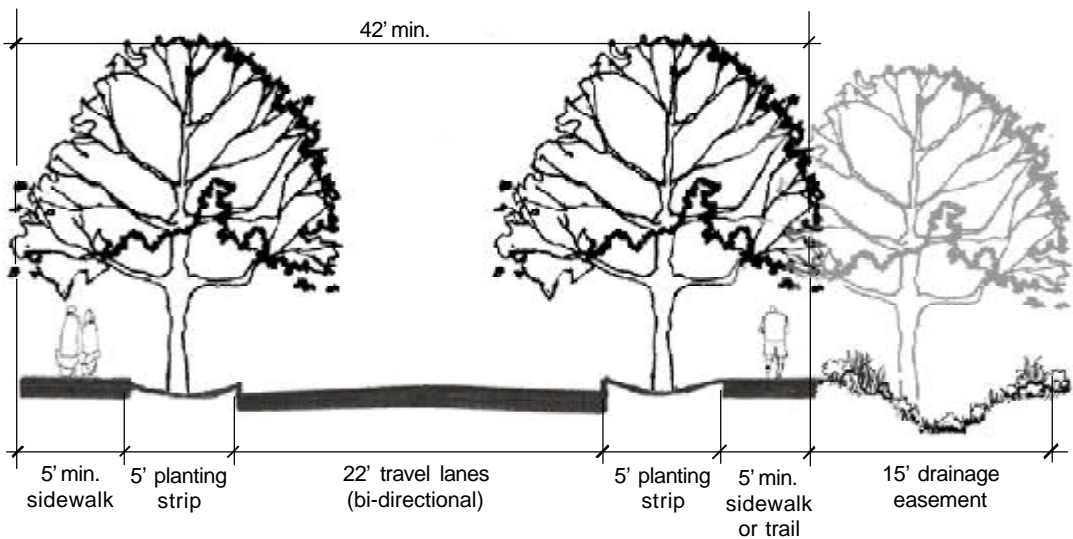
Road Section C --- Baca Area Road at Neighborhood Edge
